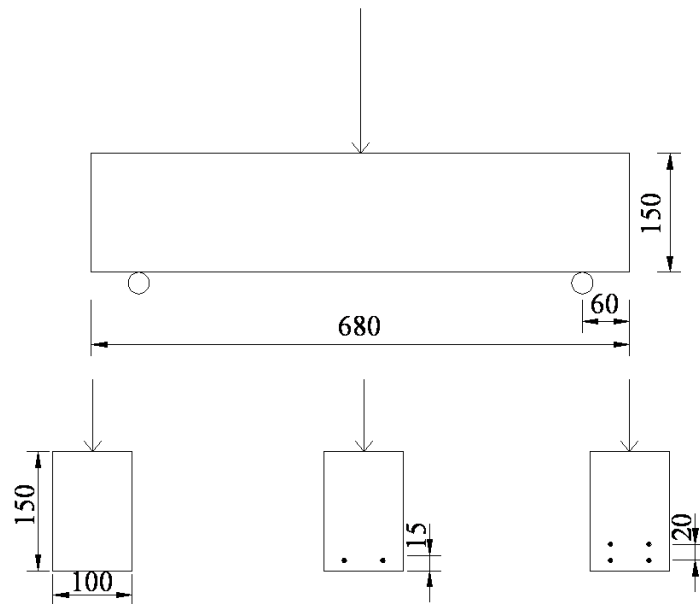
Cross sections and reinforcement arrangement of concrete beam (unit: mm).
